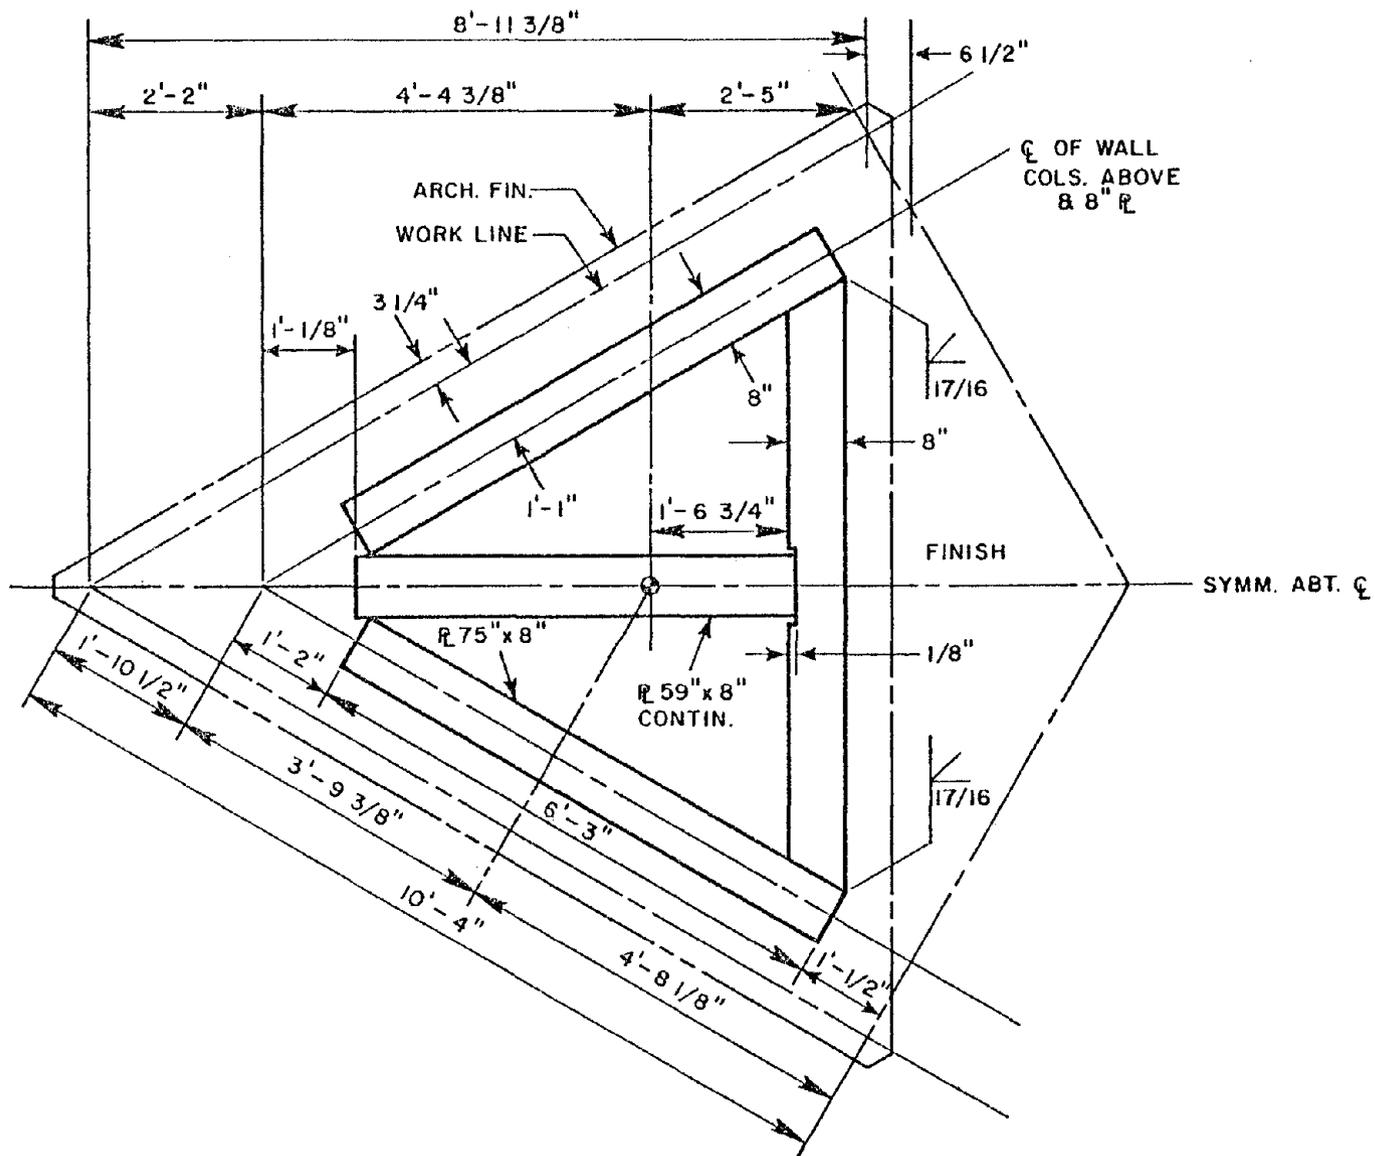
CORNER COLUMN SECTION-PLAZA LEVEL
